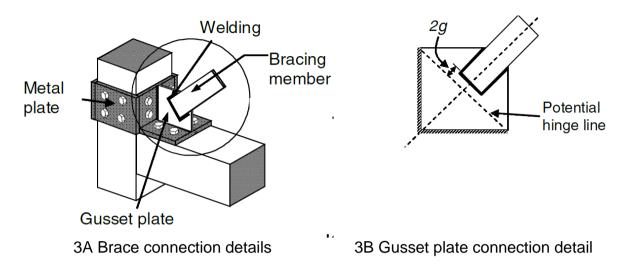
Brace connection when adding new steel braces within the beam-column bays of RC frame with additional steel members
